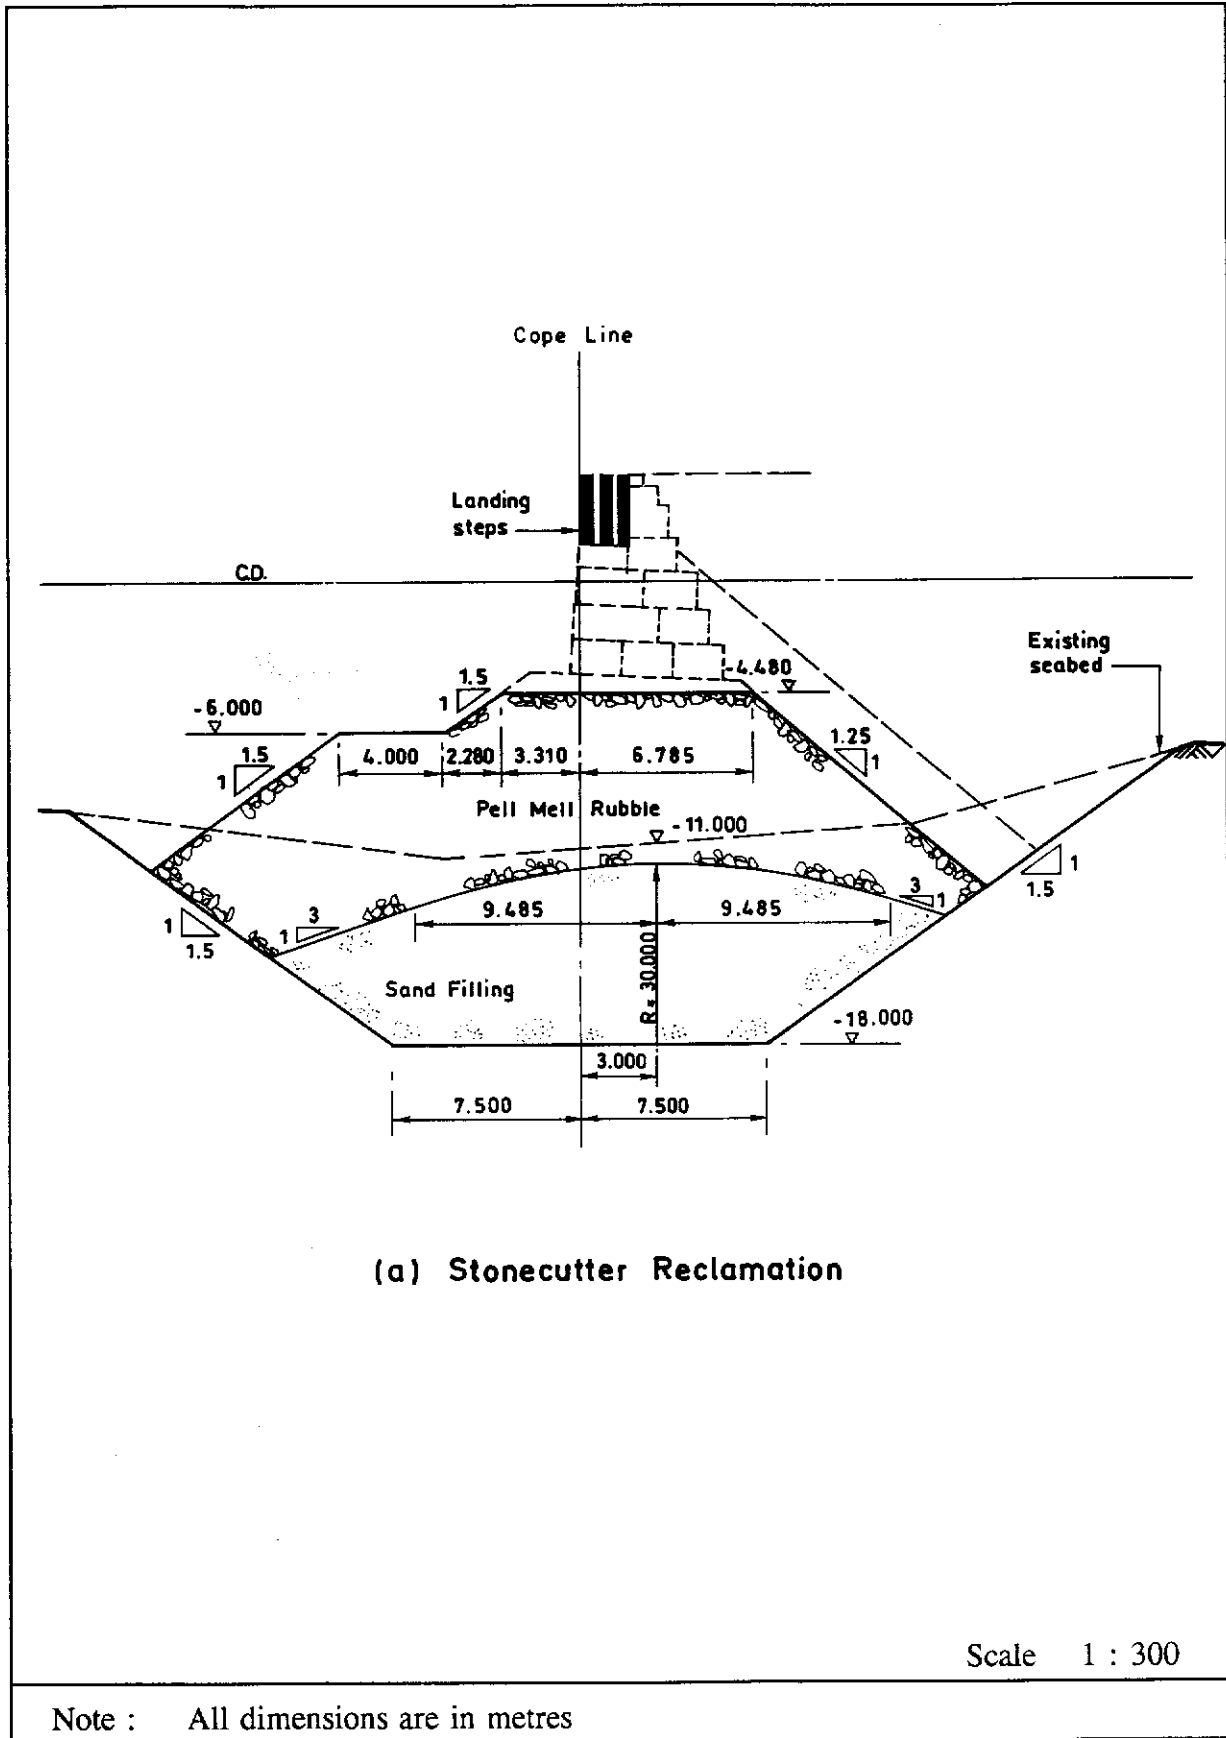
Typical Seawall Sections (Sheet 1 of 3)
